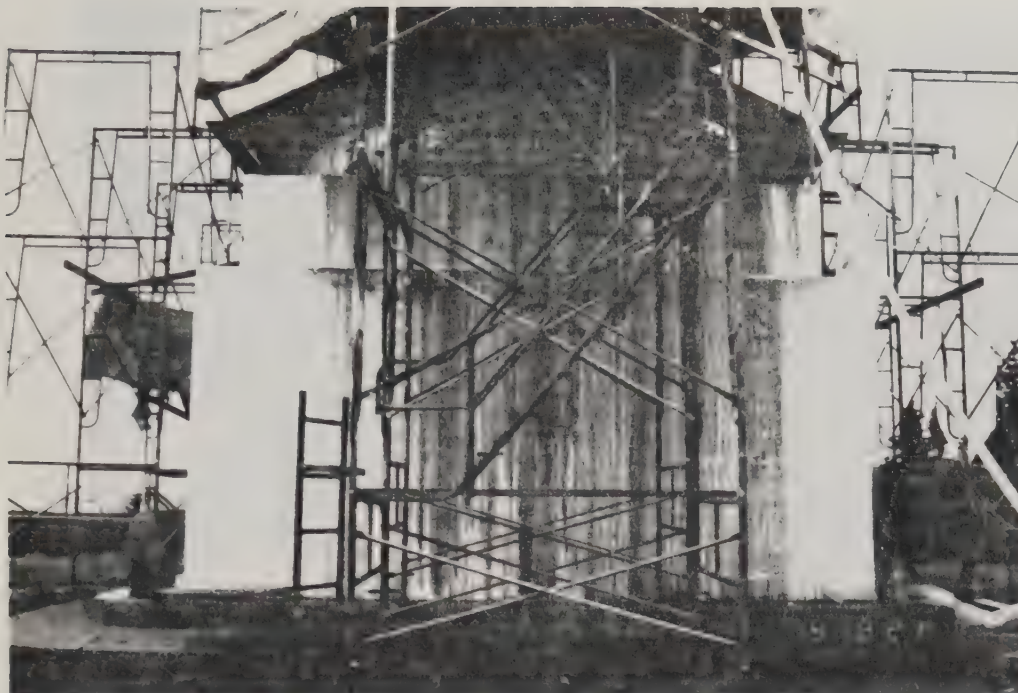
Photo Astoria Column Detail Residue, Oil Removal-AUG 1989
